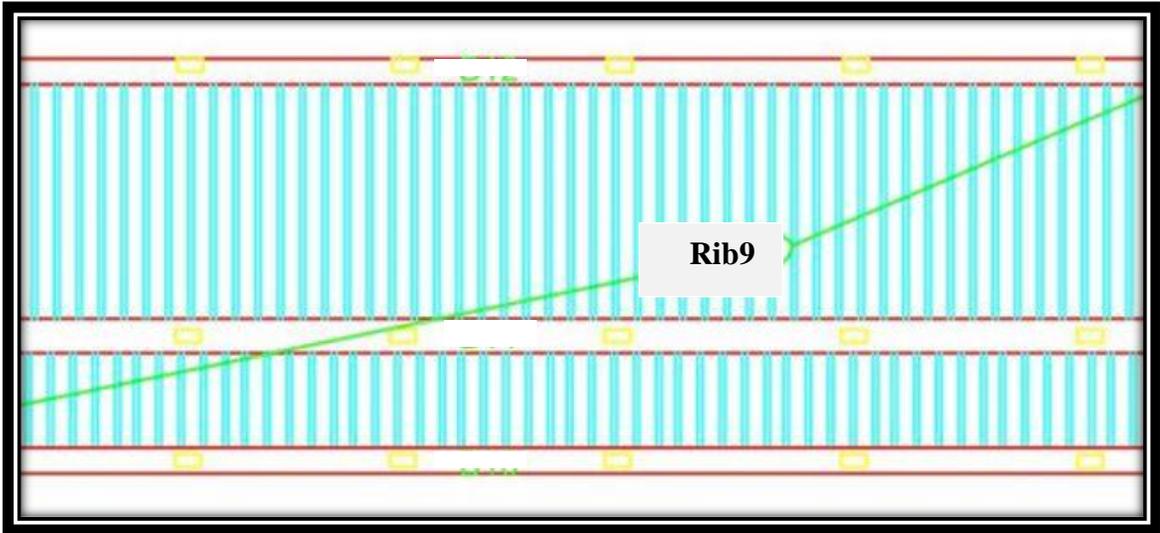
One Way Rib Slab (Rib 9) in ground floor .
